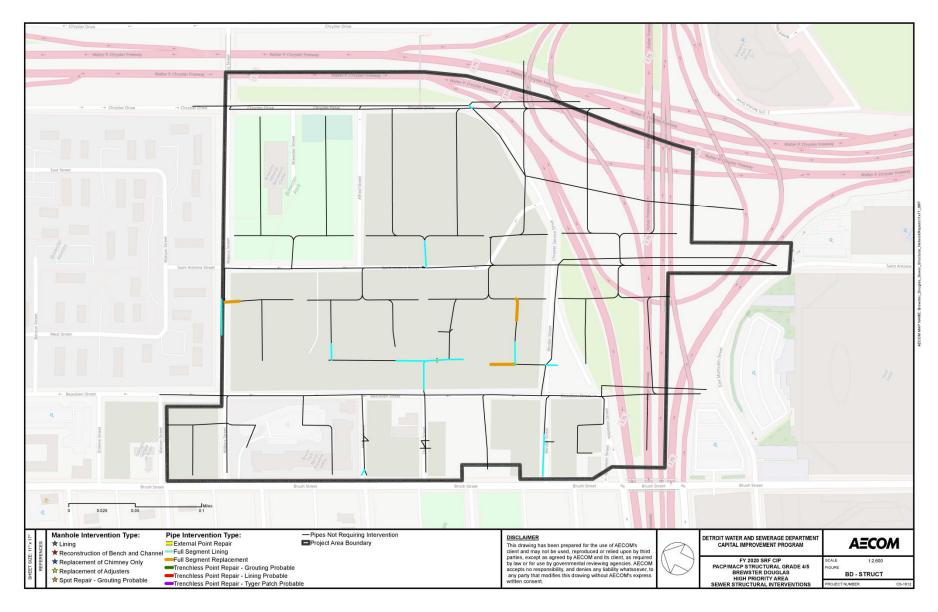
Brewster – Douglas Sewer Structural Network Repairs
